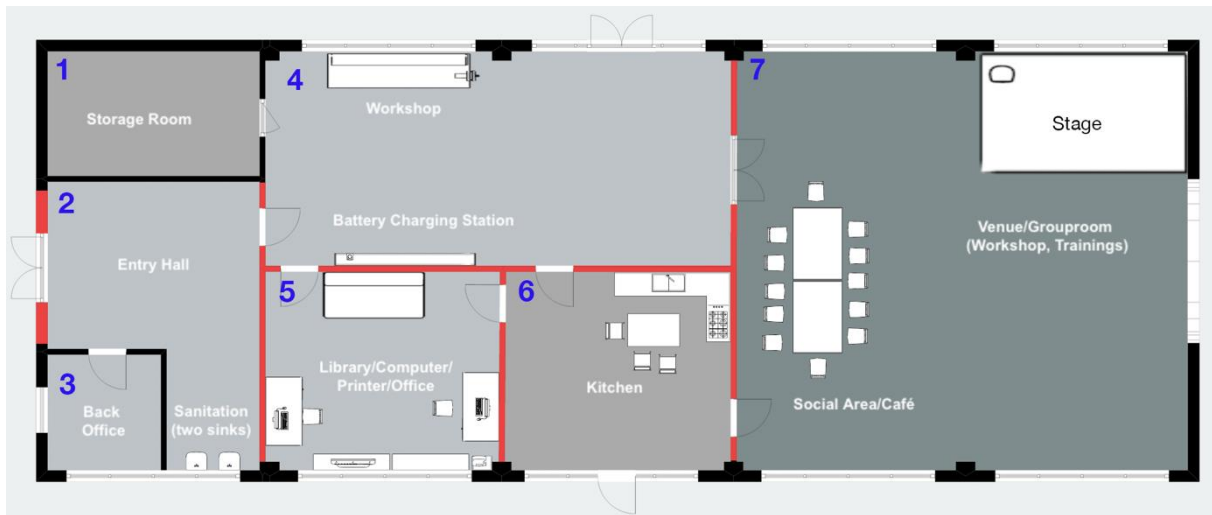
Proposed retrofit of the existing warehouse in Ward 10
